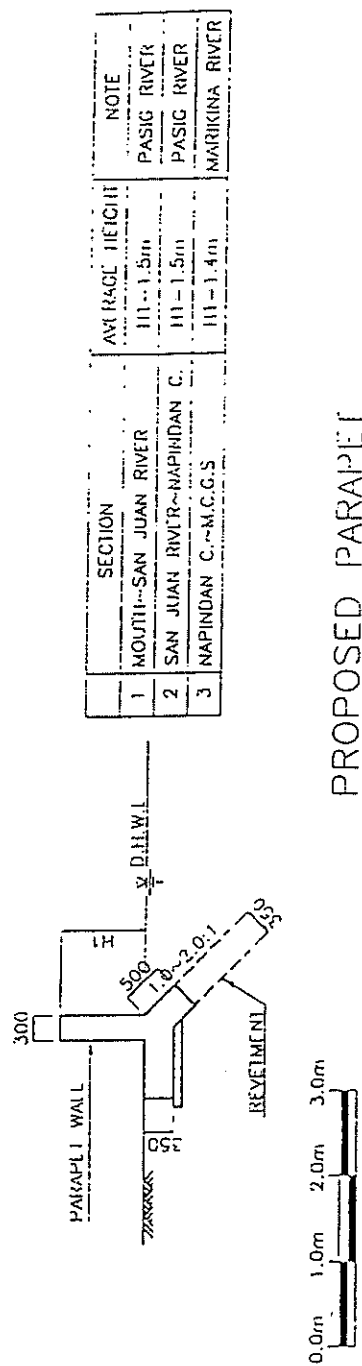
CROSS SECTION OF PROPOSED RIVER BANK AND REVETMENT
